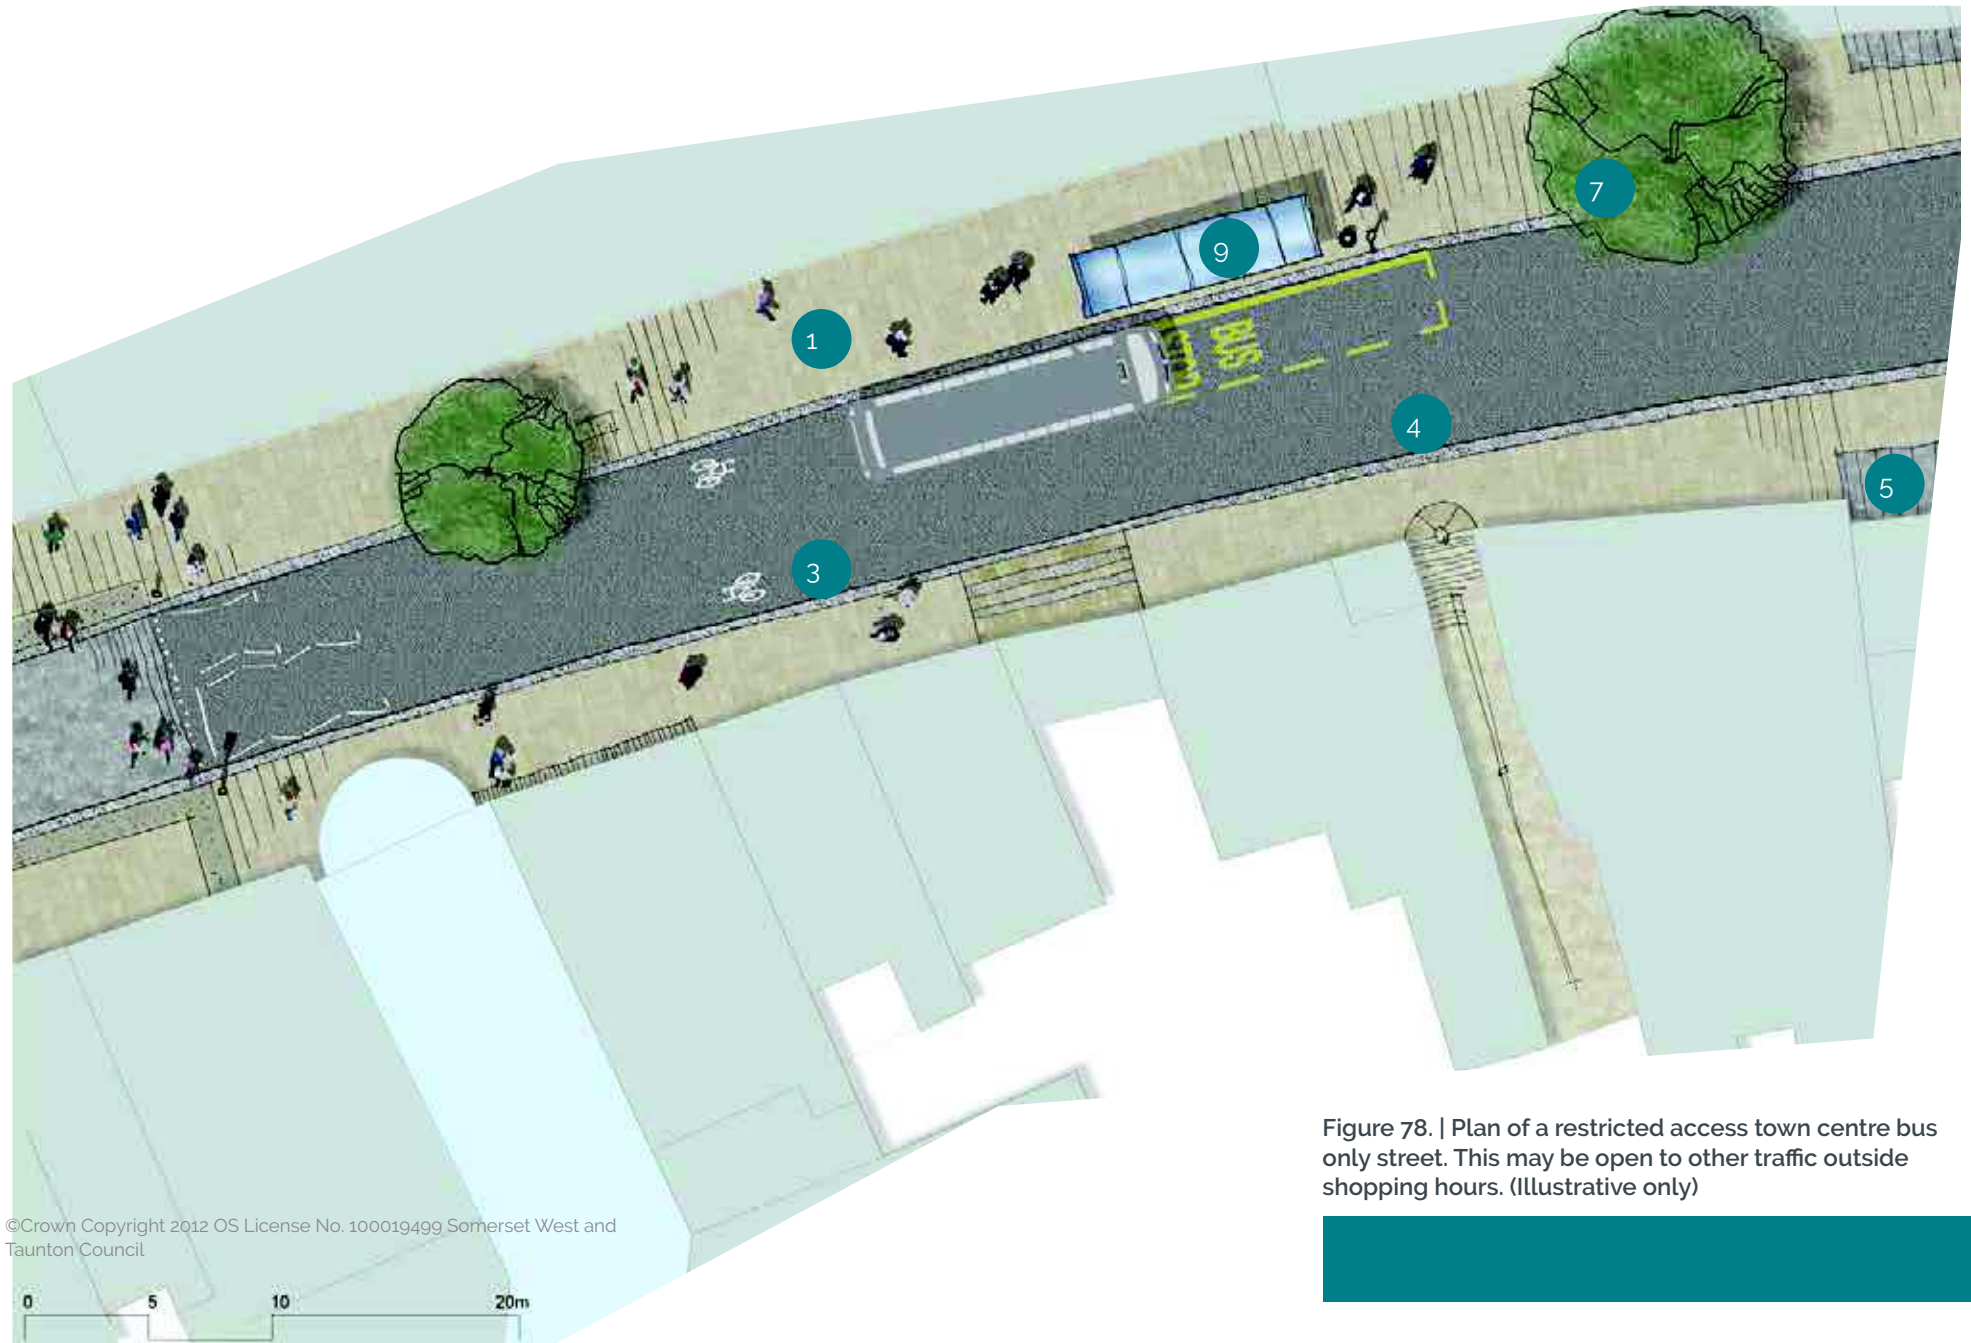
| Plan of a restricted access town centre bus only street. This may be open to other traffic outside shopping hours. (Illustrative only)
